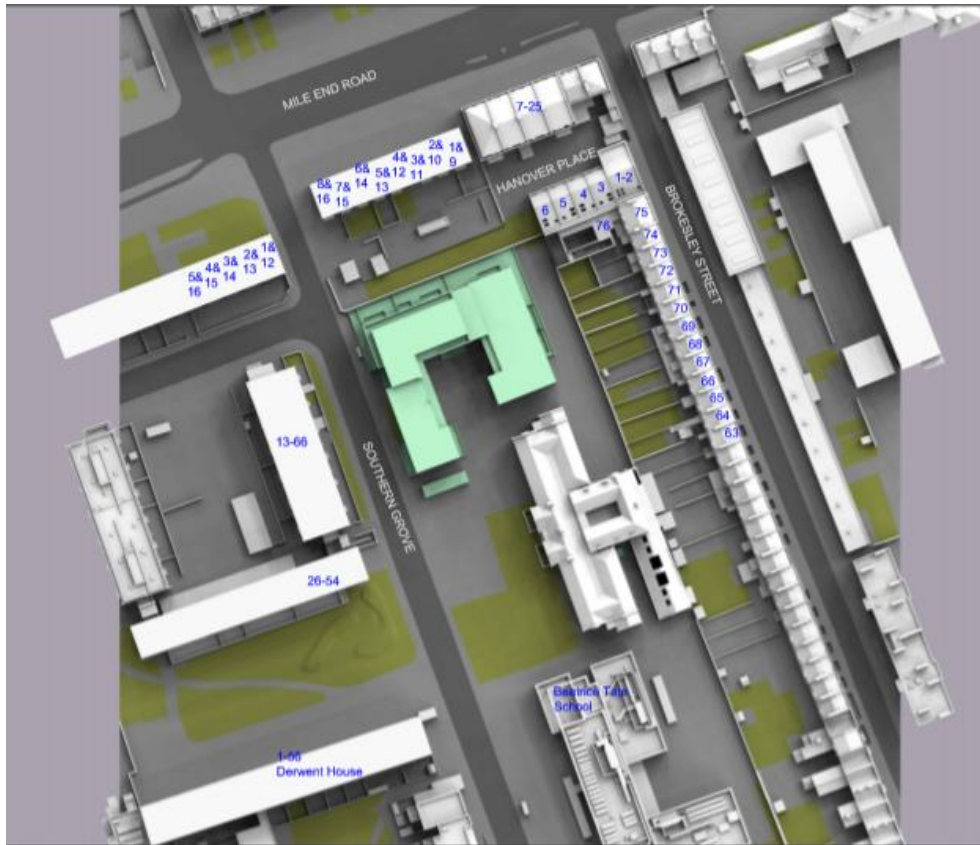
Plan view of neighbouring buildings in relation to proposal.
